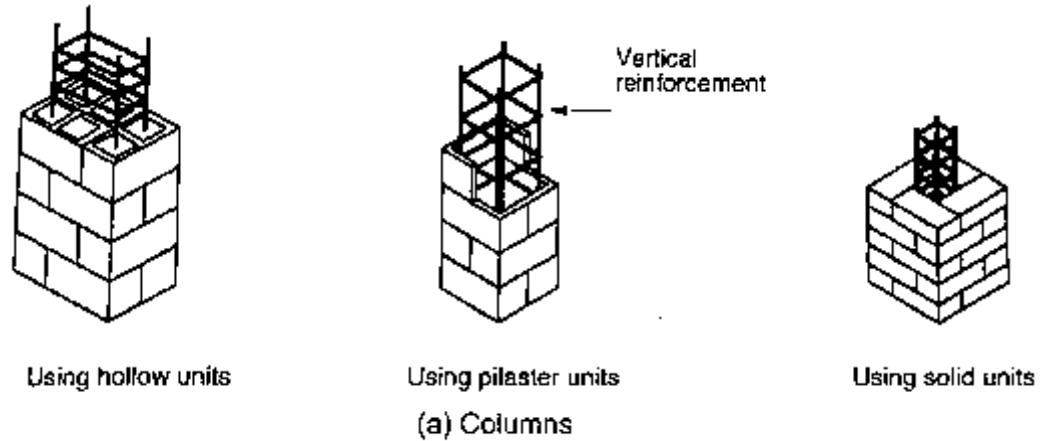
Reinforced masonry column construction (Drysdale & Hamid, 2005).
